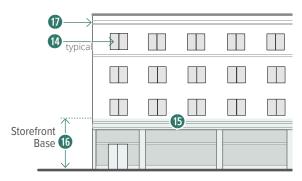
Storefront Building Section: Height & Use Requirements
